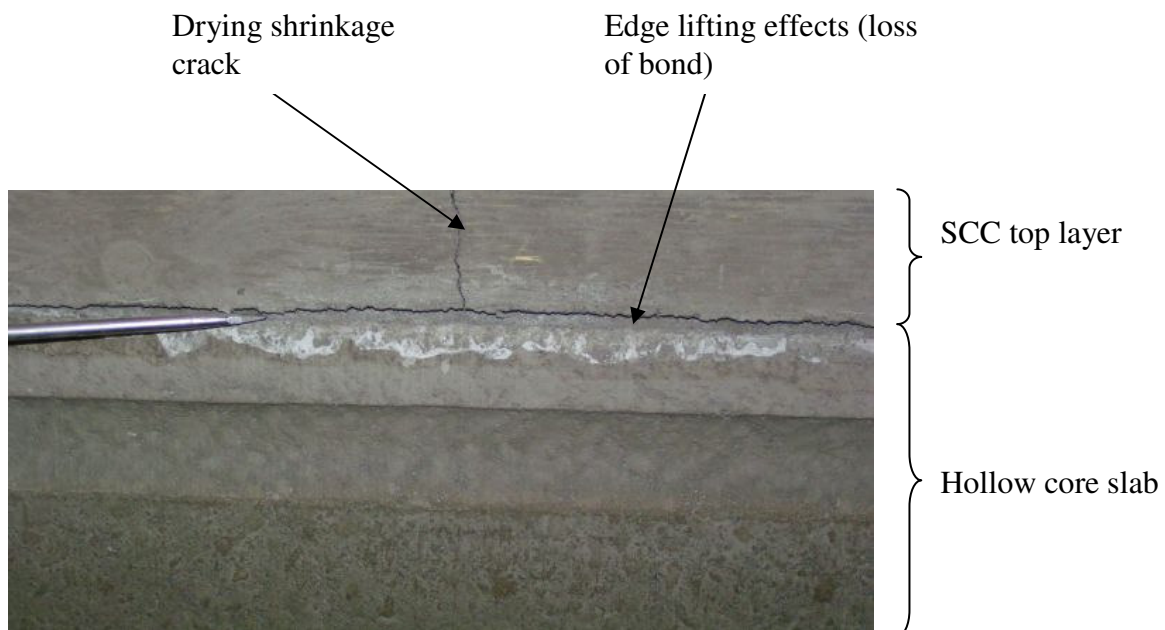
After dismantling the formwork, heavy edge lifting could be observed five weeks after casting.
